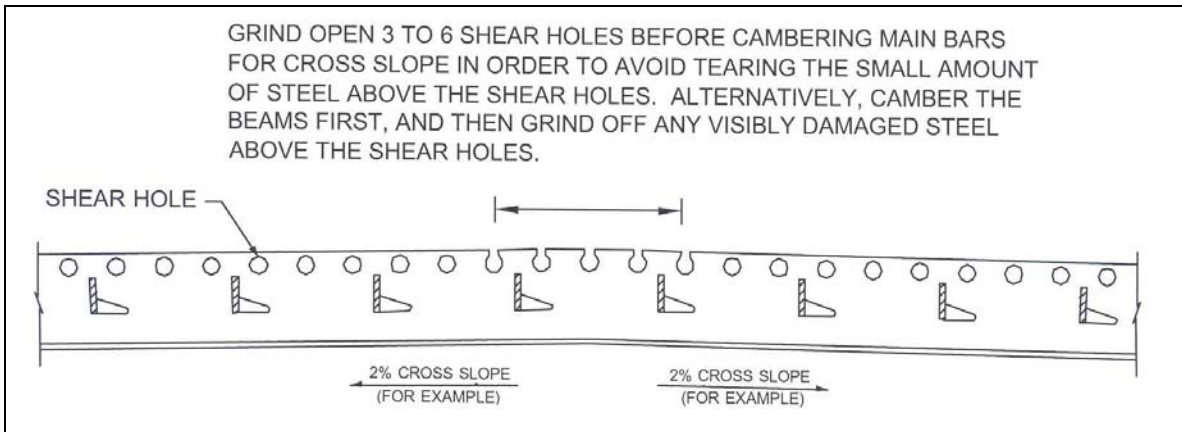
Modification of shear holes for cambered panels (Exodermic Bridge Deck, Inc., 2003)
